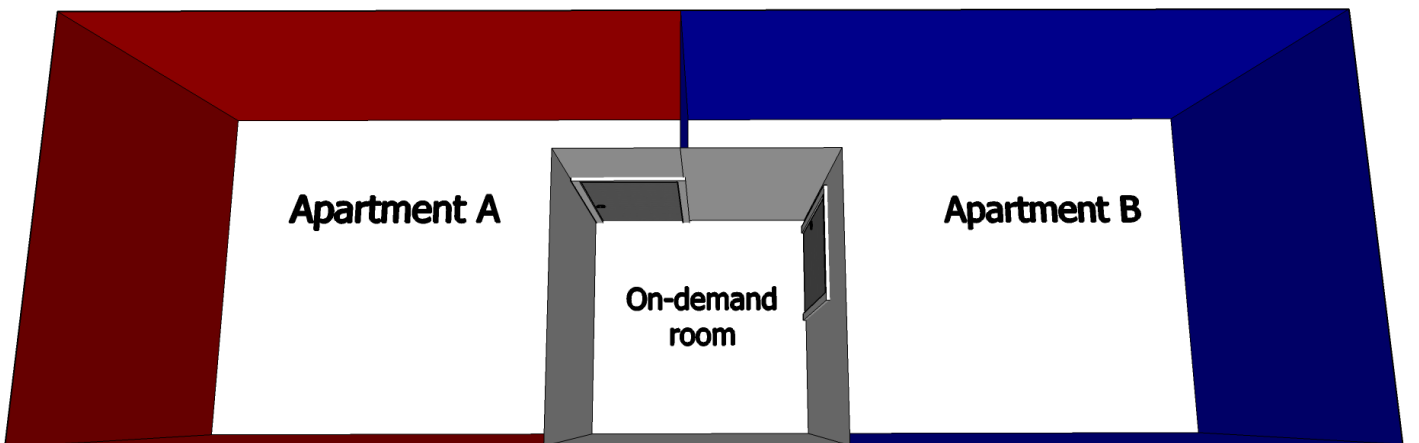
Plan of a building floor made of two apartments and an on-demand room in between
